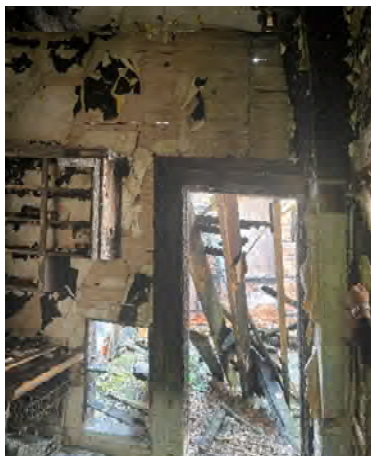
Condition of interior elements - heavily deteriorated and not intact.
